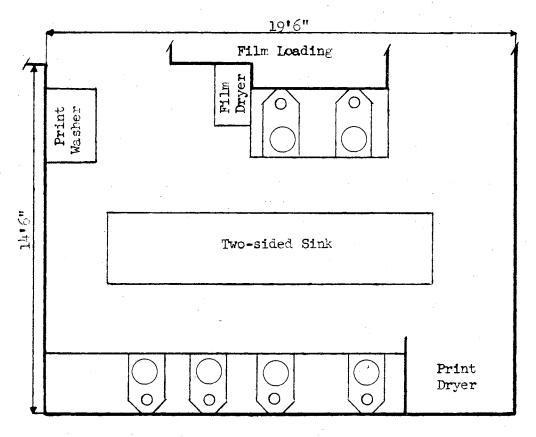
PRINTING ROOM FLOOR PLAN - DAILY OKLAHOMAN-TIMES. (SCALE 1/4" = 1")
